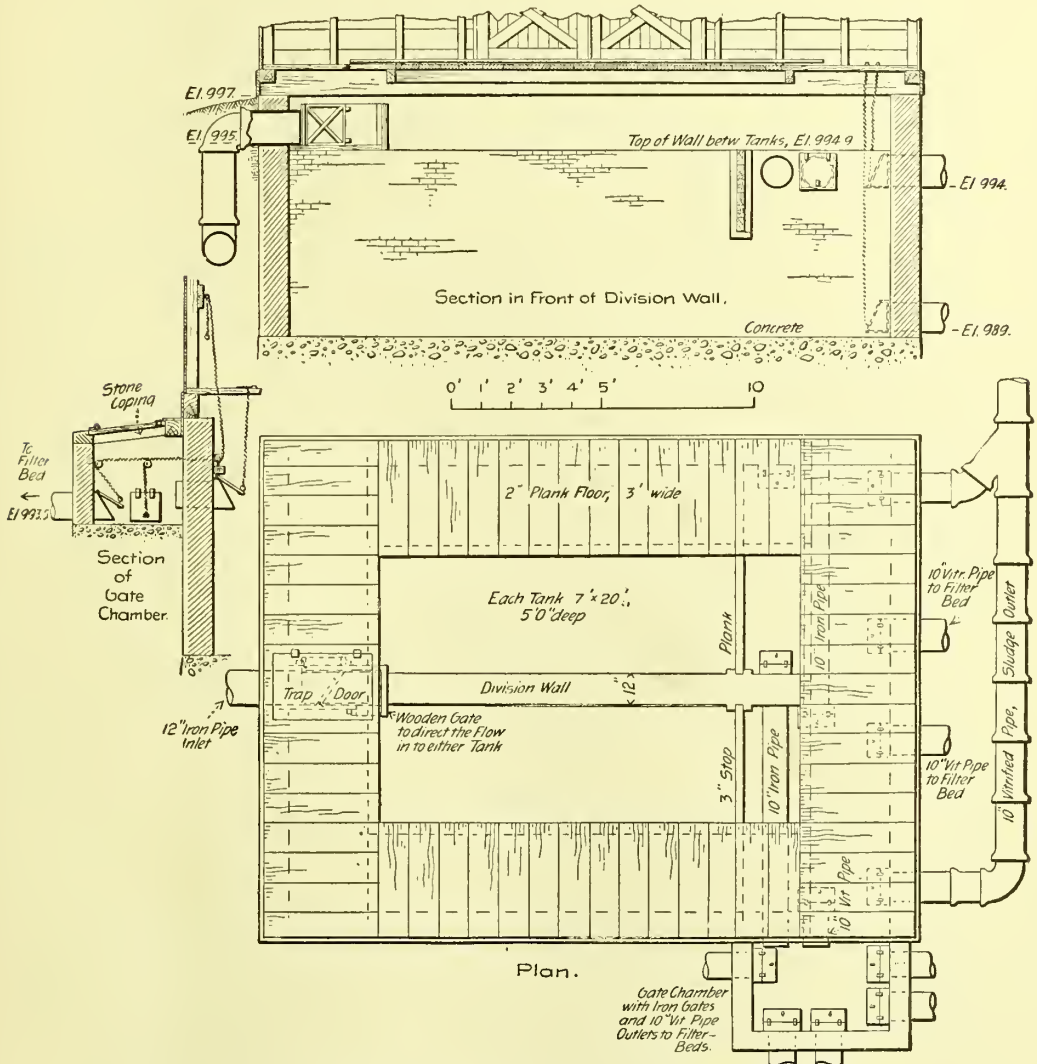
PLAN AND SECTION OF SETTLING TANK, GARDNER, MASSACHUSETTS.
